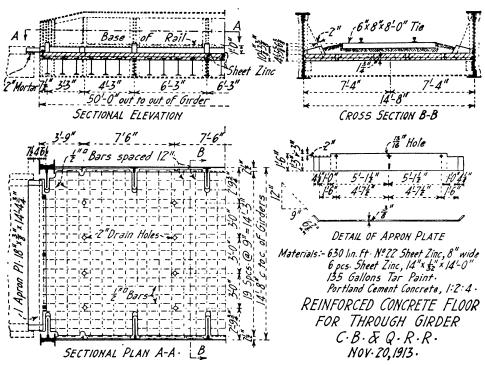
Reinforced Concrete Floor for Through Plate Girder Bridge. C. B. & Q. R. R.
